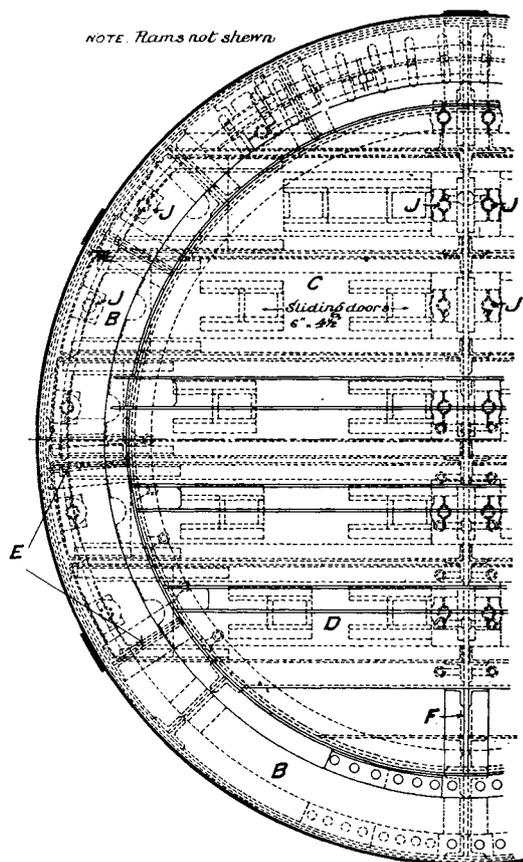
BAKER STREET AND WATERLOO RAILWAY, LONDON.
